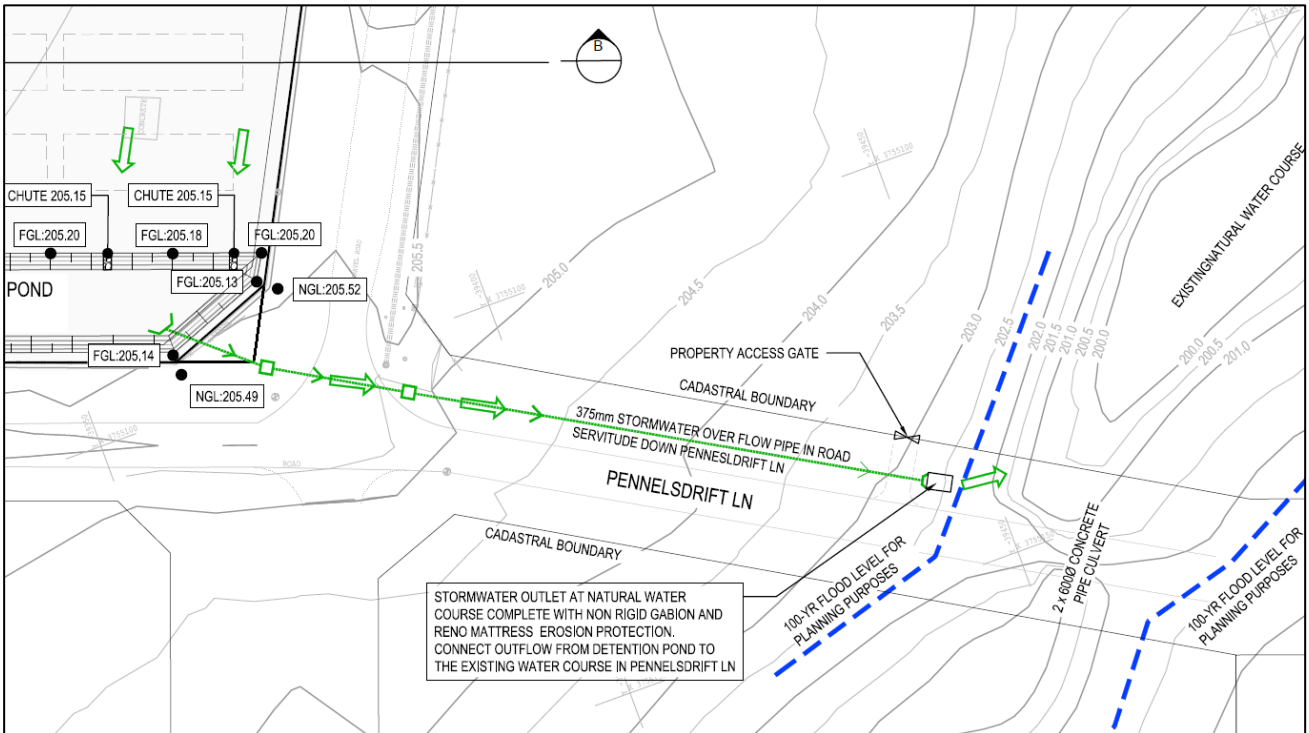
Stormwater management plan showing the proposed stormwater pipe extending from the site along the road reserve to the proposed stormwater outlet with reno mattress erosion protection.
